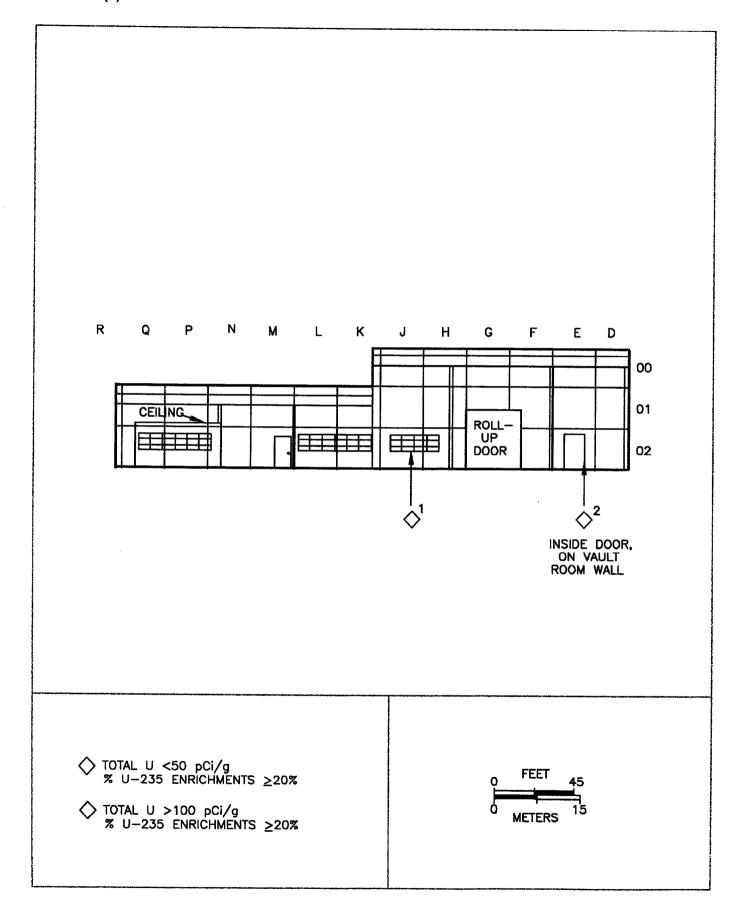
Building 3, North Wall - Measurement and Sampling Locations
